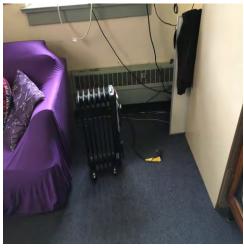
View of carpet over non asbestos tile, plywood and VAT on 1st floor. VAT
